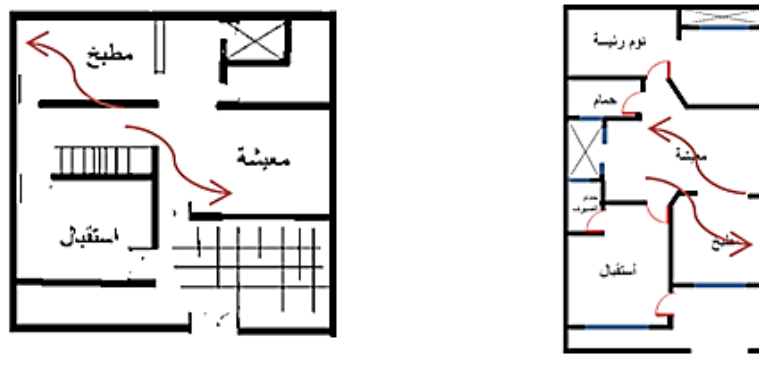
Examples of open plan arrangement in a ground floor plan in contemporary Baghdadi houses after 2003.
